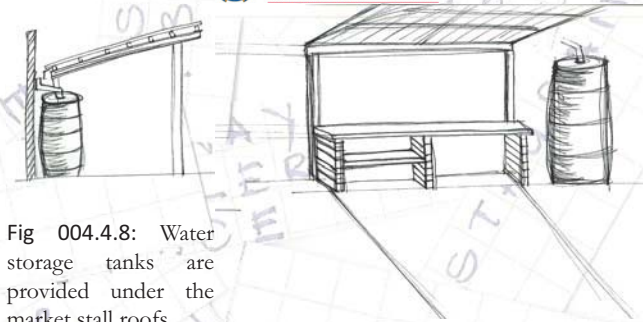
Water storage tanks are provided under the market stall roofs
